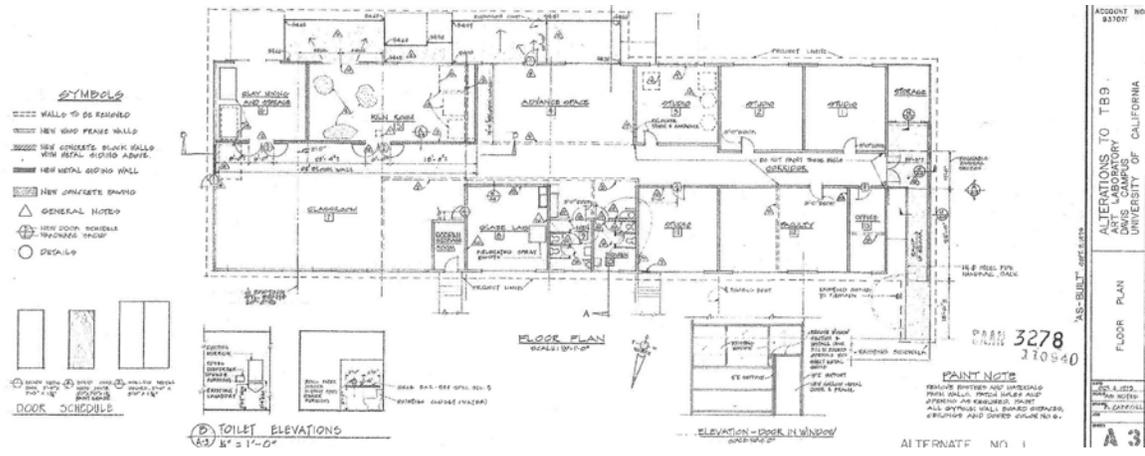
TB-9 floor plan, October 1975. Courtesy of Planning, Facilities and Safety, UC Davis.
